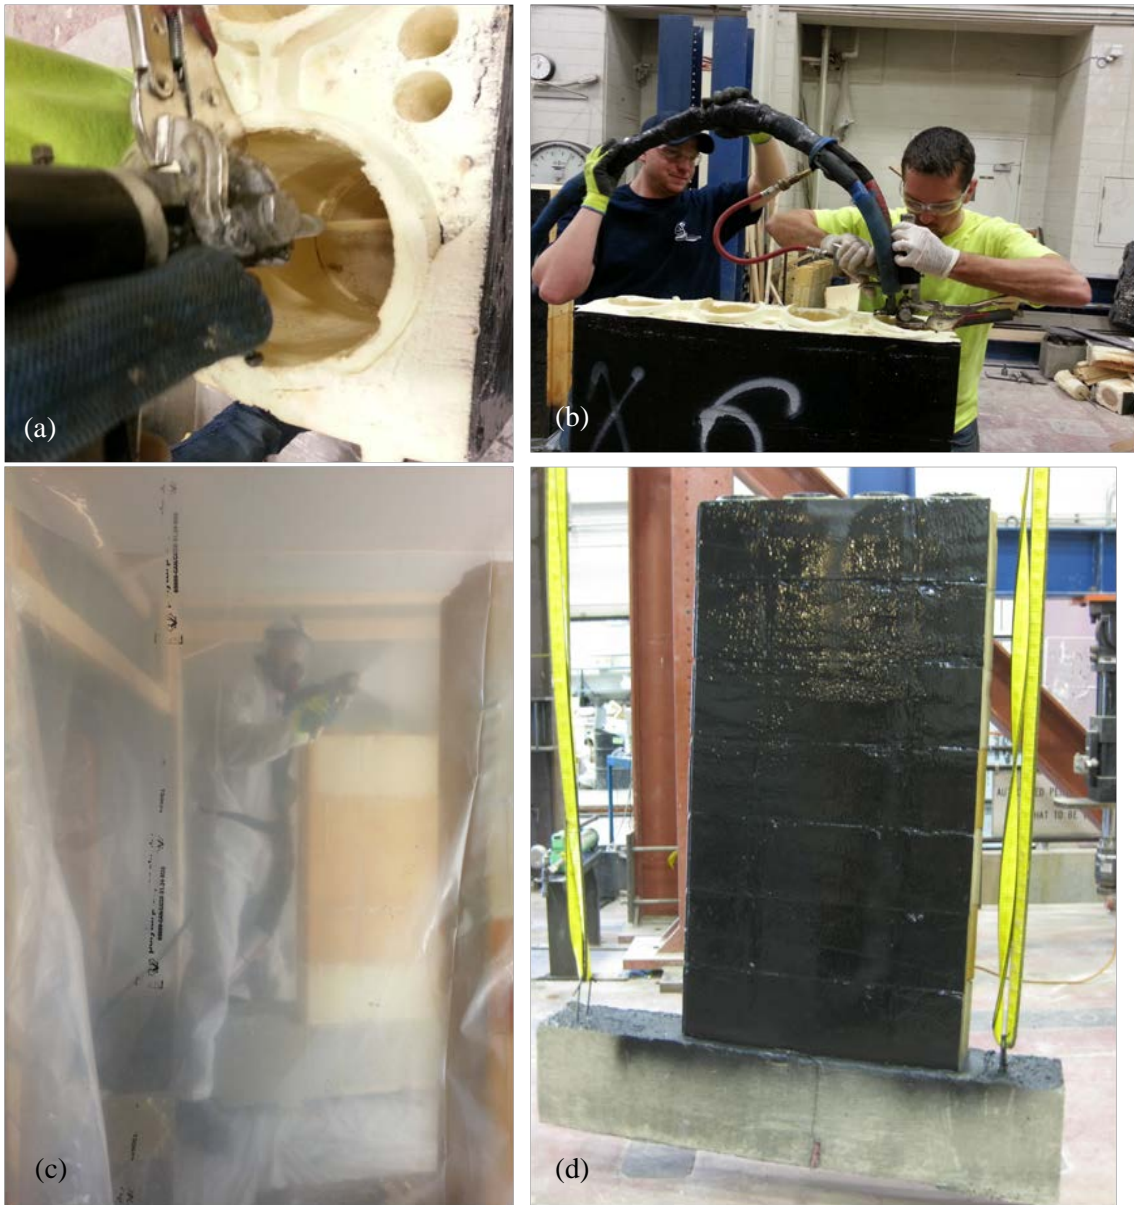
Construction steps of the walls, Polyurethane injection and Polyurea spraying
